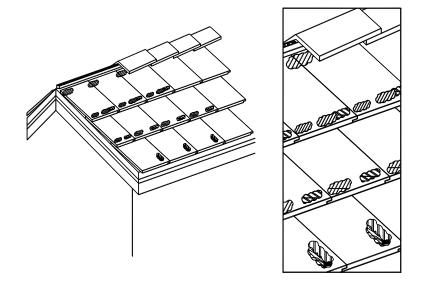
Placement Detail "A" Flat/Low Profile Roofing Tile
